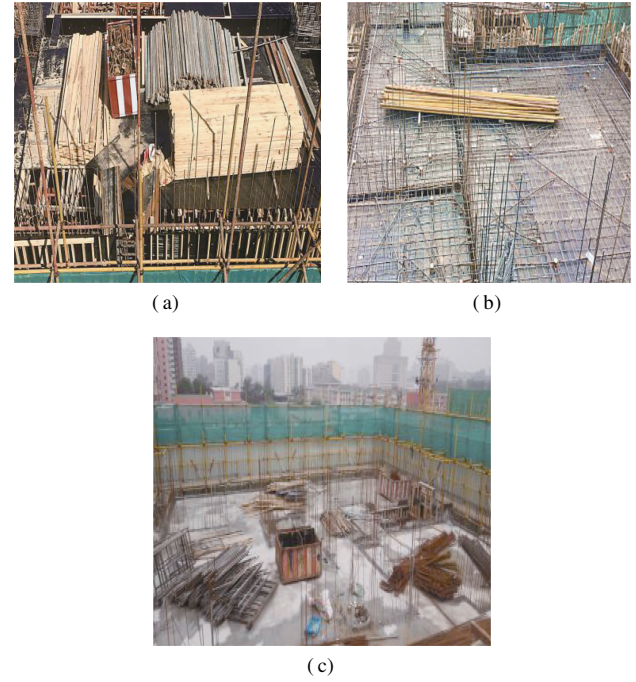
VMLs in different stages. (a) Formwork erection stage; (b) Reinforcement binding stage; (c) After concrete placement stage
